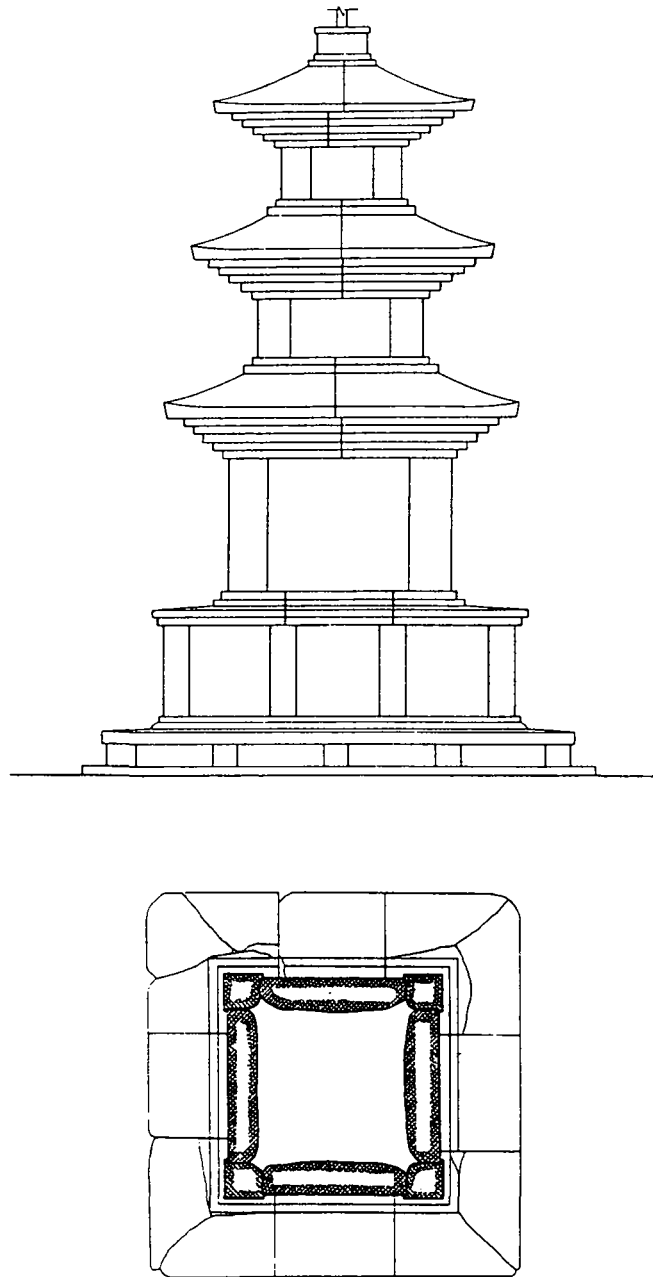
Plan of the first story and elevation of the western stone pagoda of Kam-ŭn-sa
